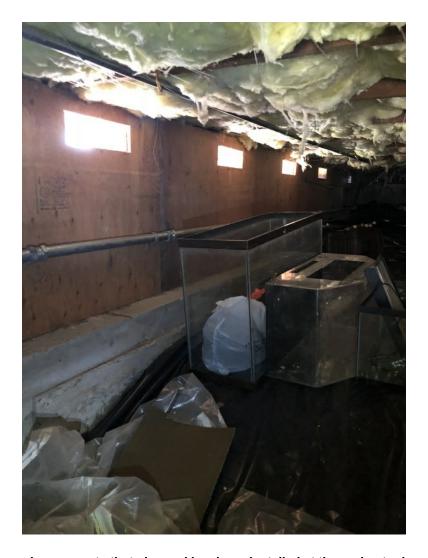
Building crawl space, note that plywood has been installed at the perimeter basement walls and that the plywood is attached to the wood framing with staples.
